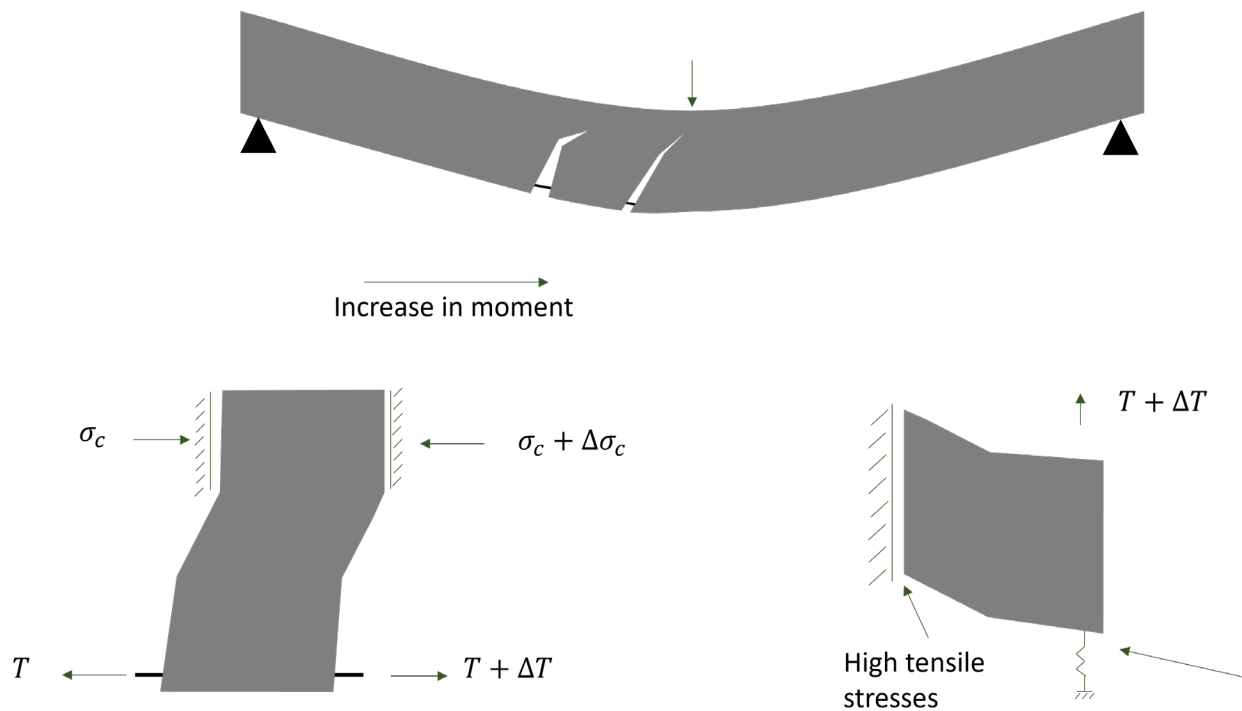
Cantilever action in concrete beams without shear reinforcement
